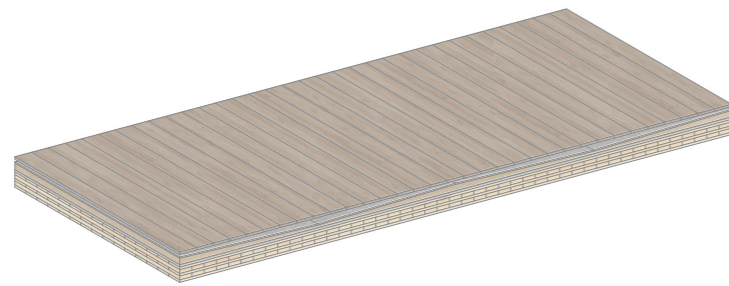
Drawing, Terrace slab module. ©Personal illustration.
